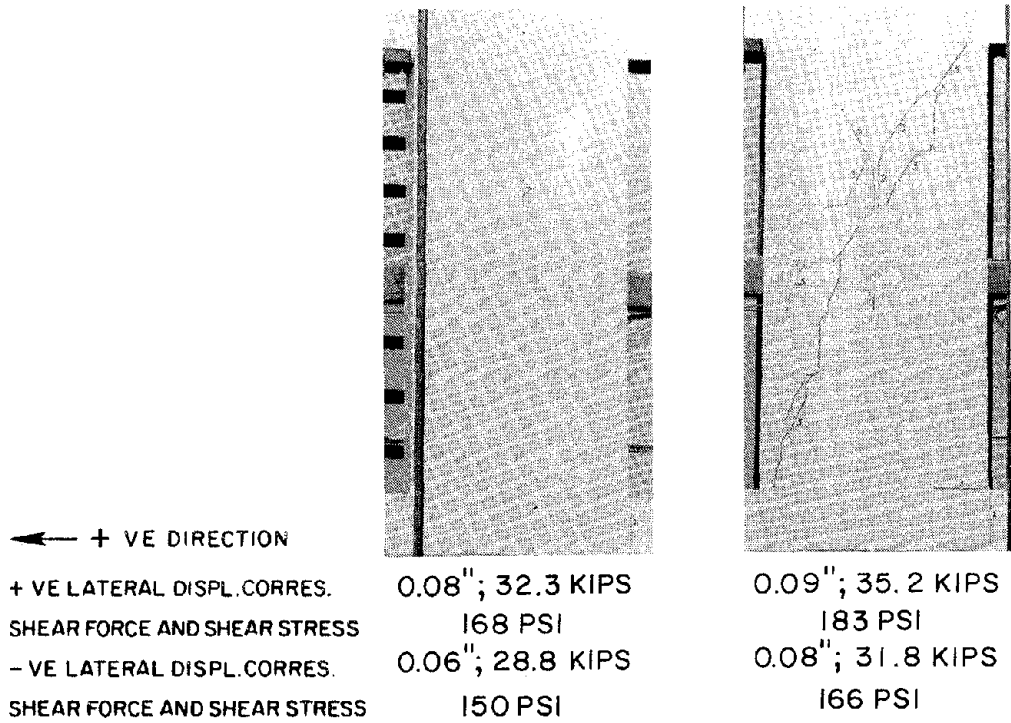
SUCCESSIVE CRACK FORMATION TEST 10. (RIGHT SIDE PIER)
